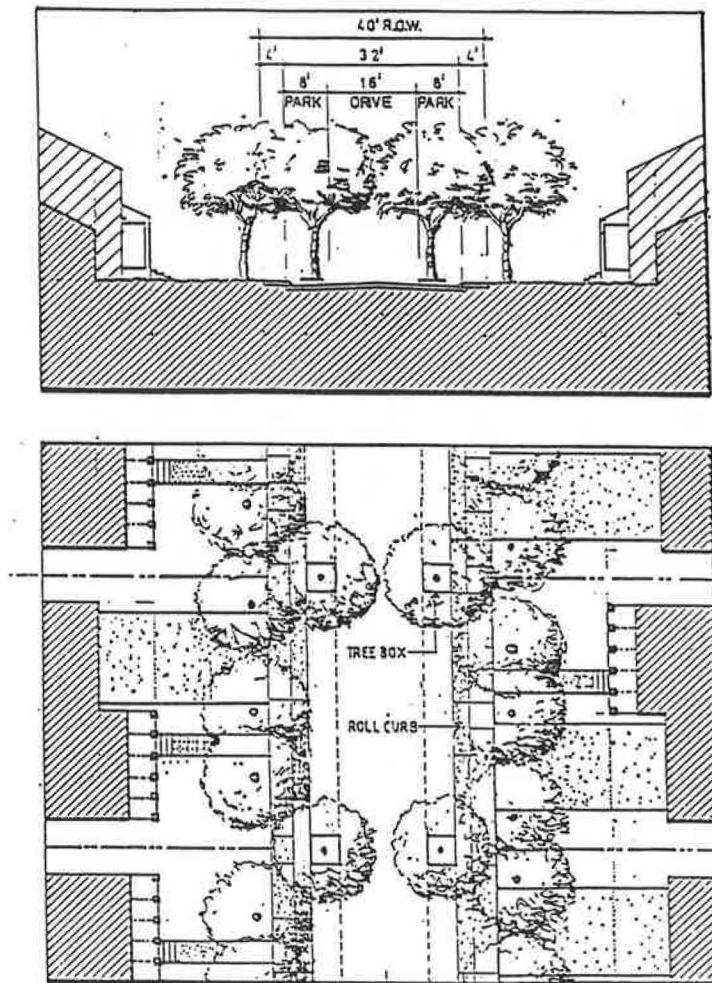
Use of tree boxes to widen street-sidewalk boundaries.
